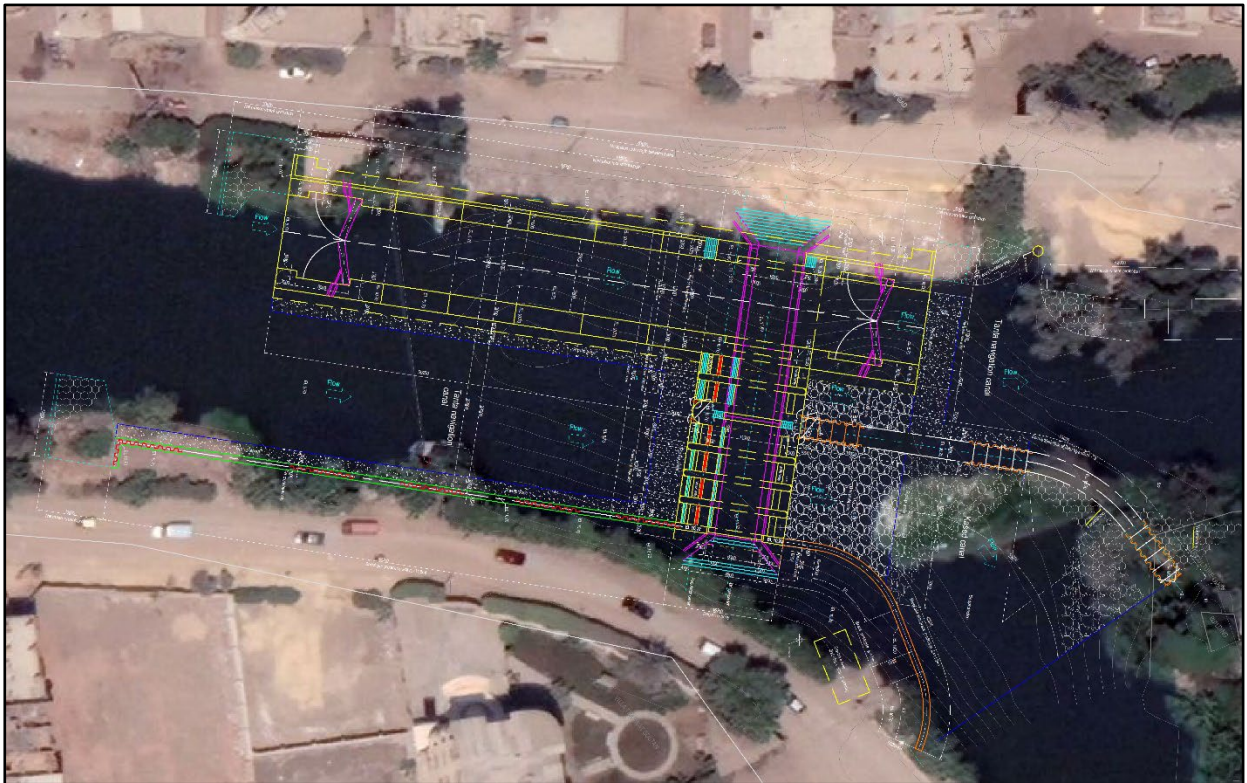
Plan of Kased Intake Structure (New Construction)
